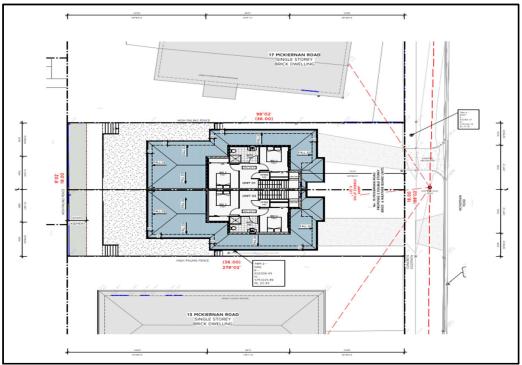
First Floor Plan of the proposed development. Source: Application submission.
